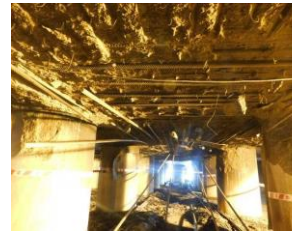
Slab. Concrete cover spalled, 3 rebar layers exposed
